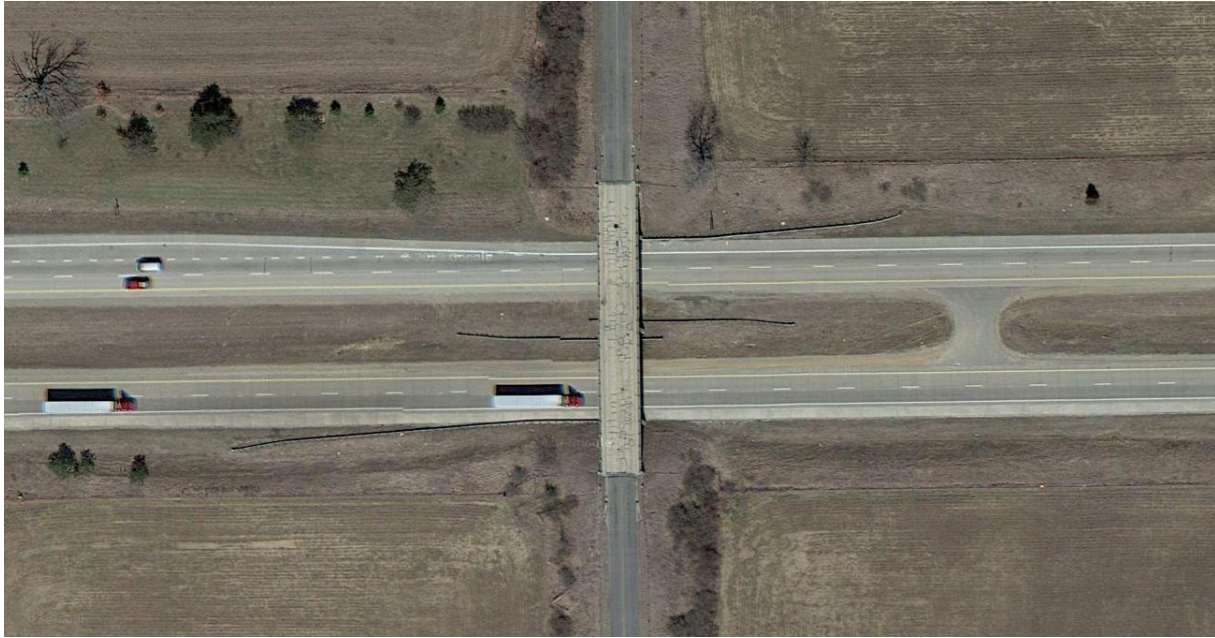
20 Mile Road Bridge over I-94 Located in Calhoun County, Michigan.
